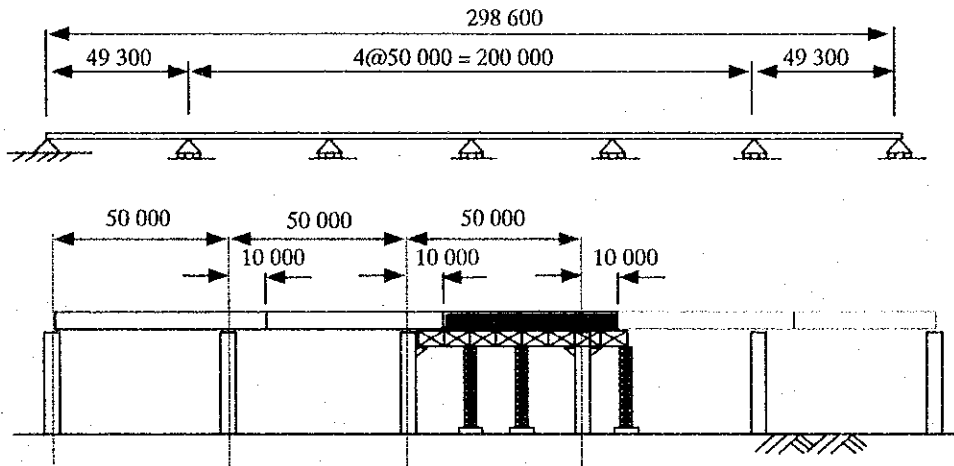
Structural Model and Assumed Construction Method for Approach Bridge 1
